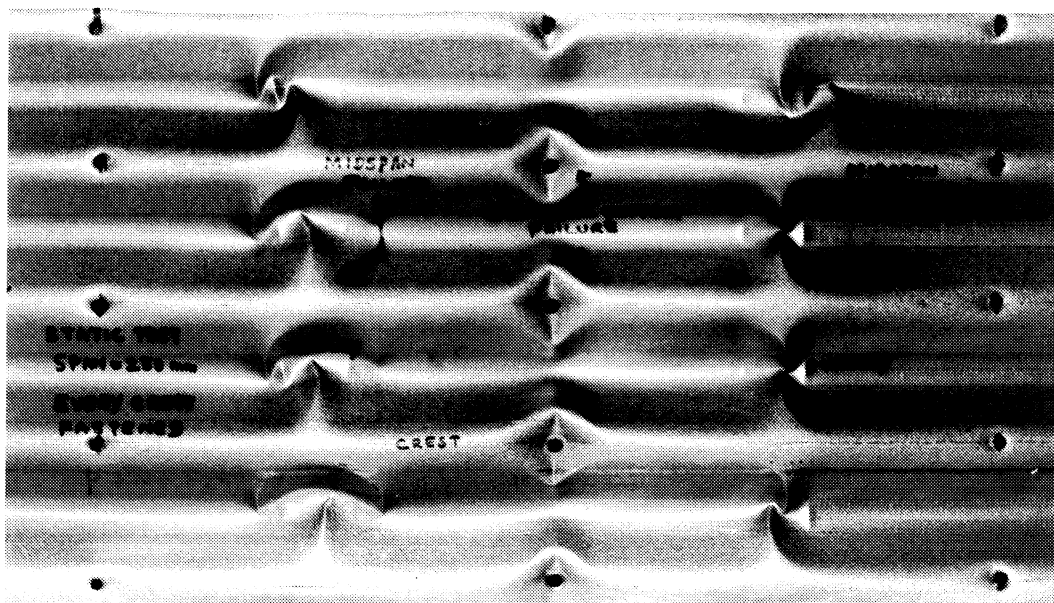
Ultimate Static Failure of Corrugated Roofing Fastened at Every Crest
